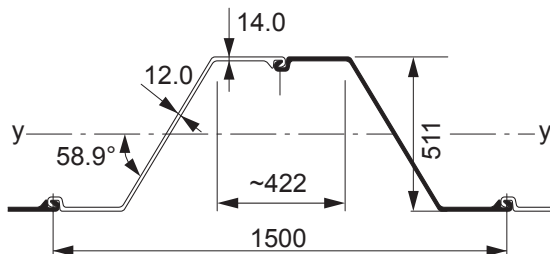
Section AZ 32-750 with dimensions in mm.
